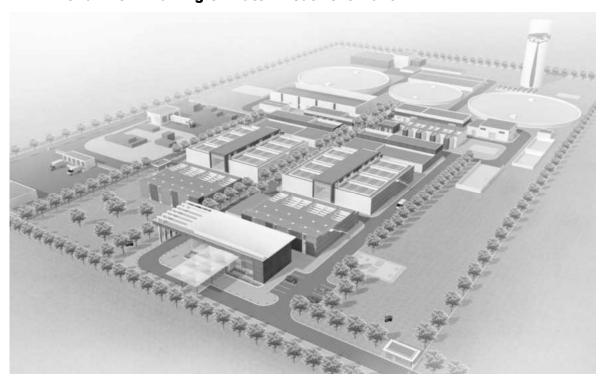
Aerial View Drawing Of Water Treatment Plant
